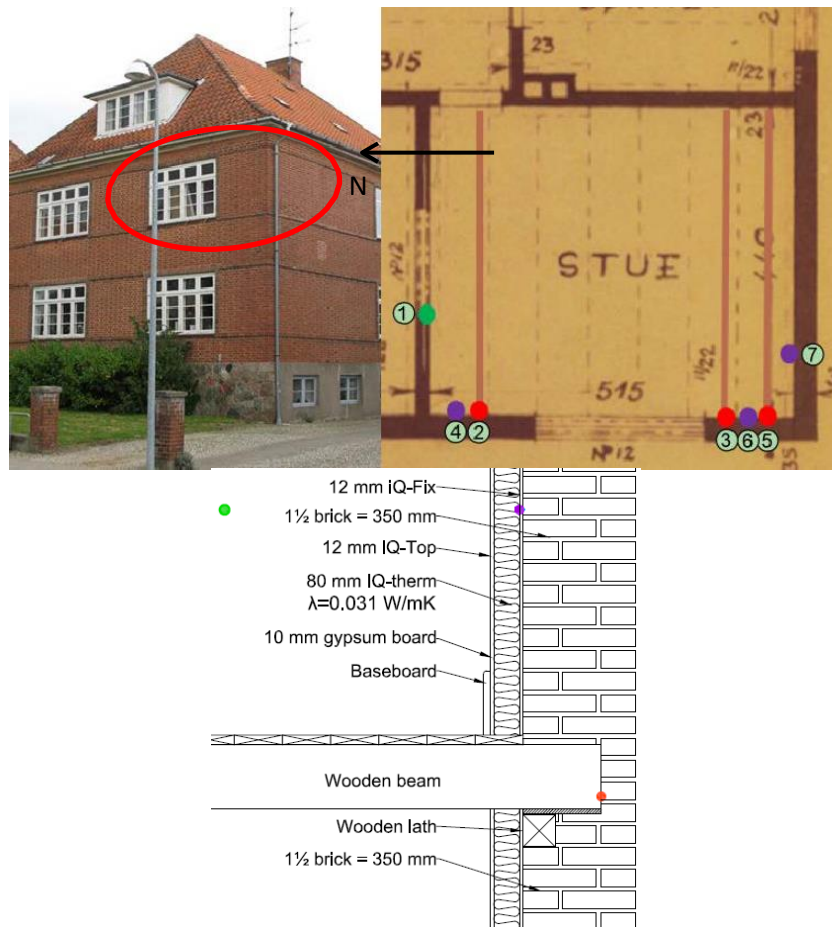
Ny Allegade and indication of wall placement (left), sensor placement on floor plan (middle) and construction with sensor placement (right)
